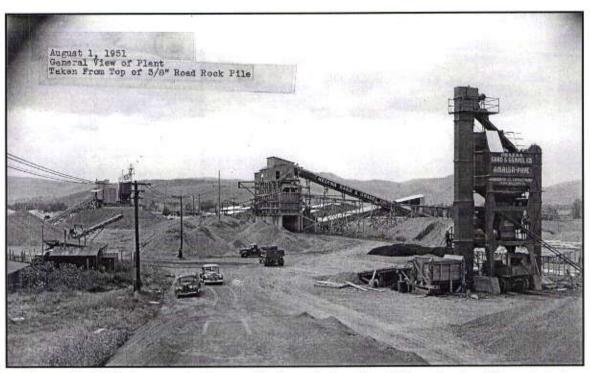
1951 photograph of new cold-mix asphalt outfit at Helena Sand and Gravel plant (courtesy of Kathy Fehlig).
